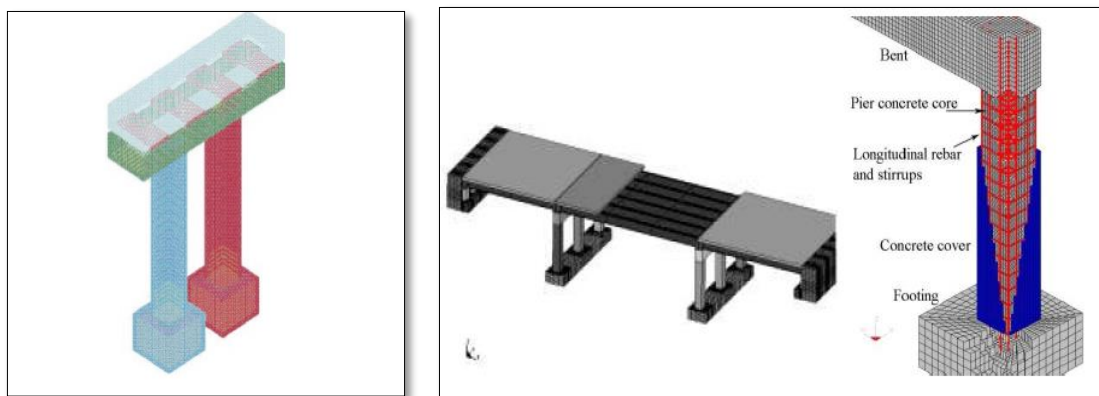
L-R Numerical Model of RC Pier; Whole Bridge Pier Model [21]
